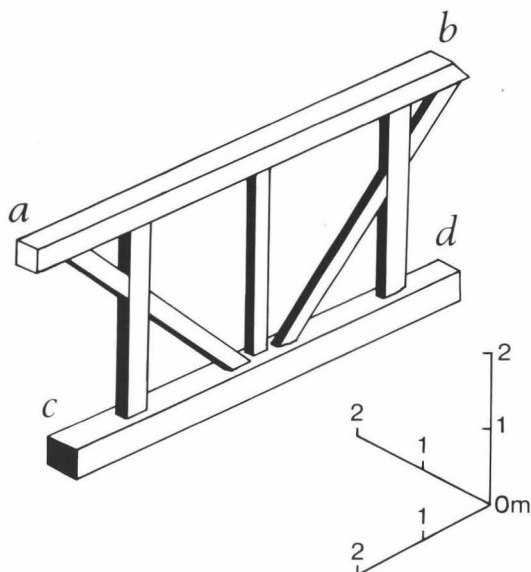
Laughton Place. Reconstruction by Miles Russell of the main trestle of the medieval bridge.
